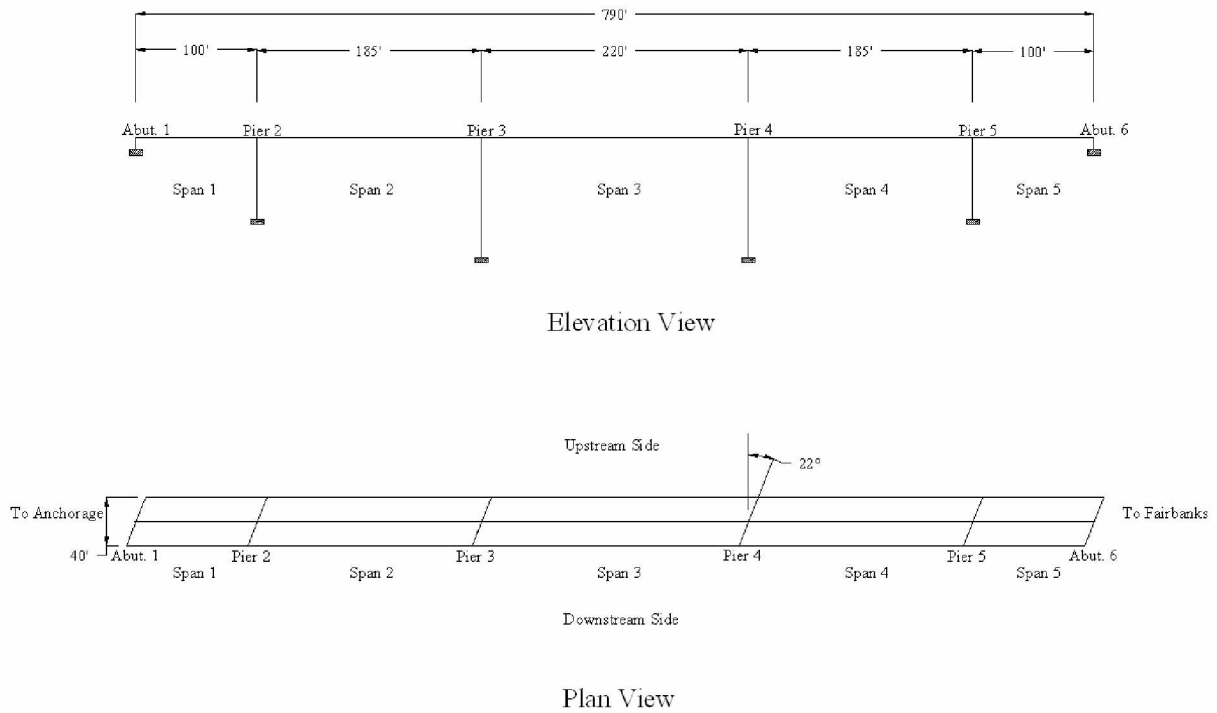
Elevation and Plan View of Chulitna River Bridge
